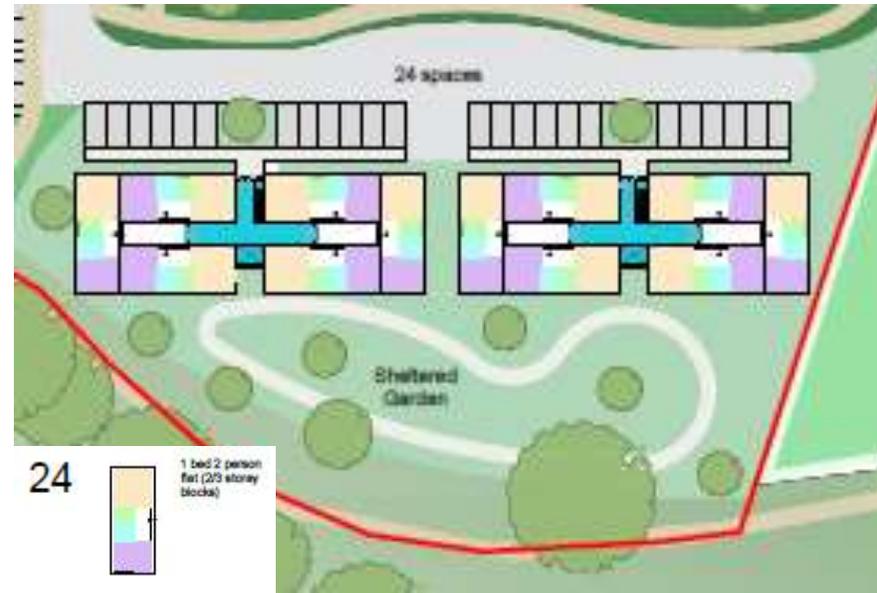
Options for design and layout of sheltered accommodation development on Site B
